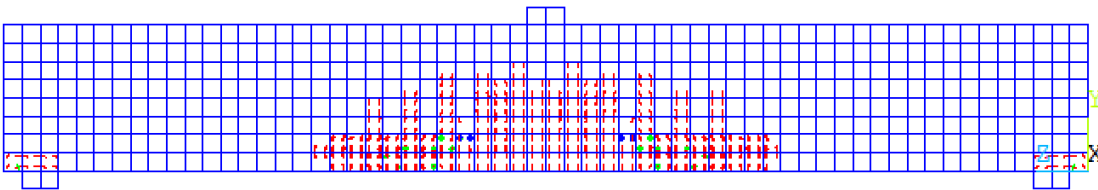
Crack Pattern under Tensile Collapsed Mechanism (B.240.25)
